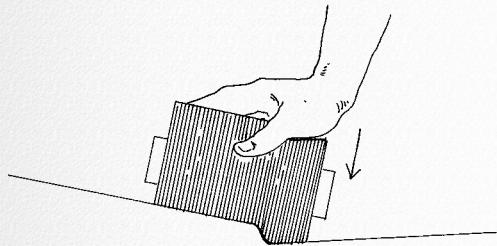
A profile gauge is used to measure small changes in level, such as shifts in sidewalk cracks and the lip of driveway and crosswalk crossings.
